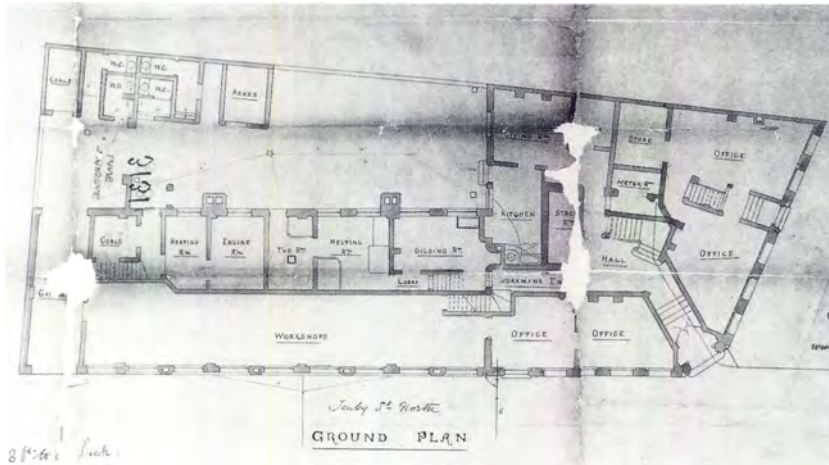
(left) The original ground plan of the former Manton and Mole Works. The workshops were separated by a spine wall from the gilding and melting rooms which incorporated more noxious processes, and which had separate entrances from a rear yard. [Reproduced by permission of Birmingham City Archives (BBP 3131) BB99/10449]
